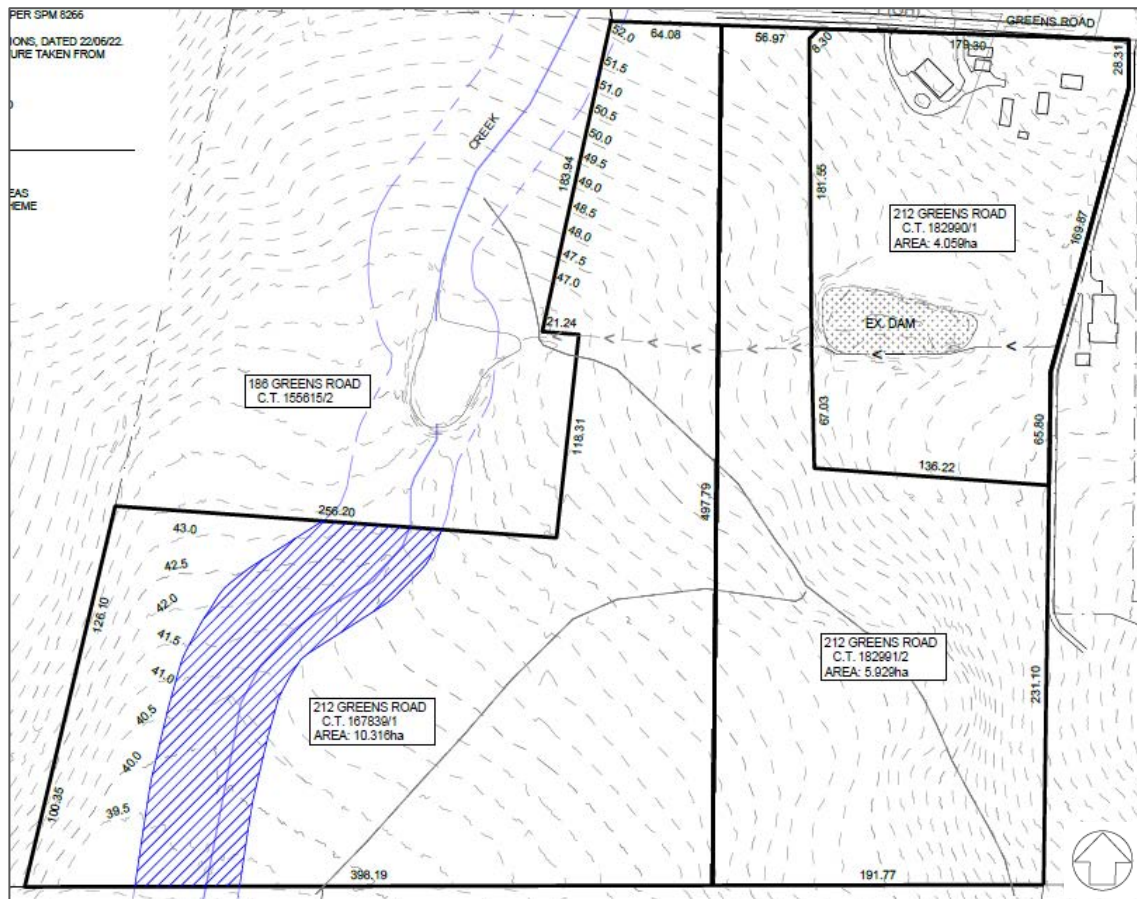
Part of Existing Site Plan C01 at 212 Greens Road, Orielton
